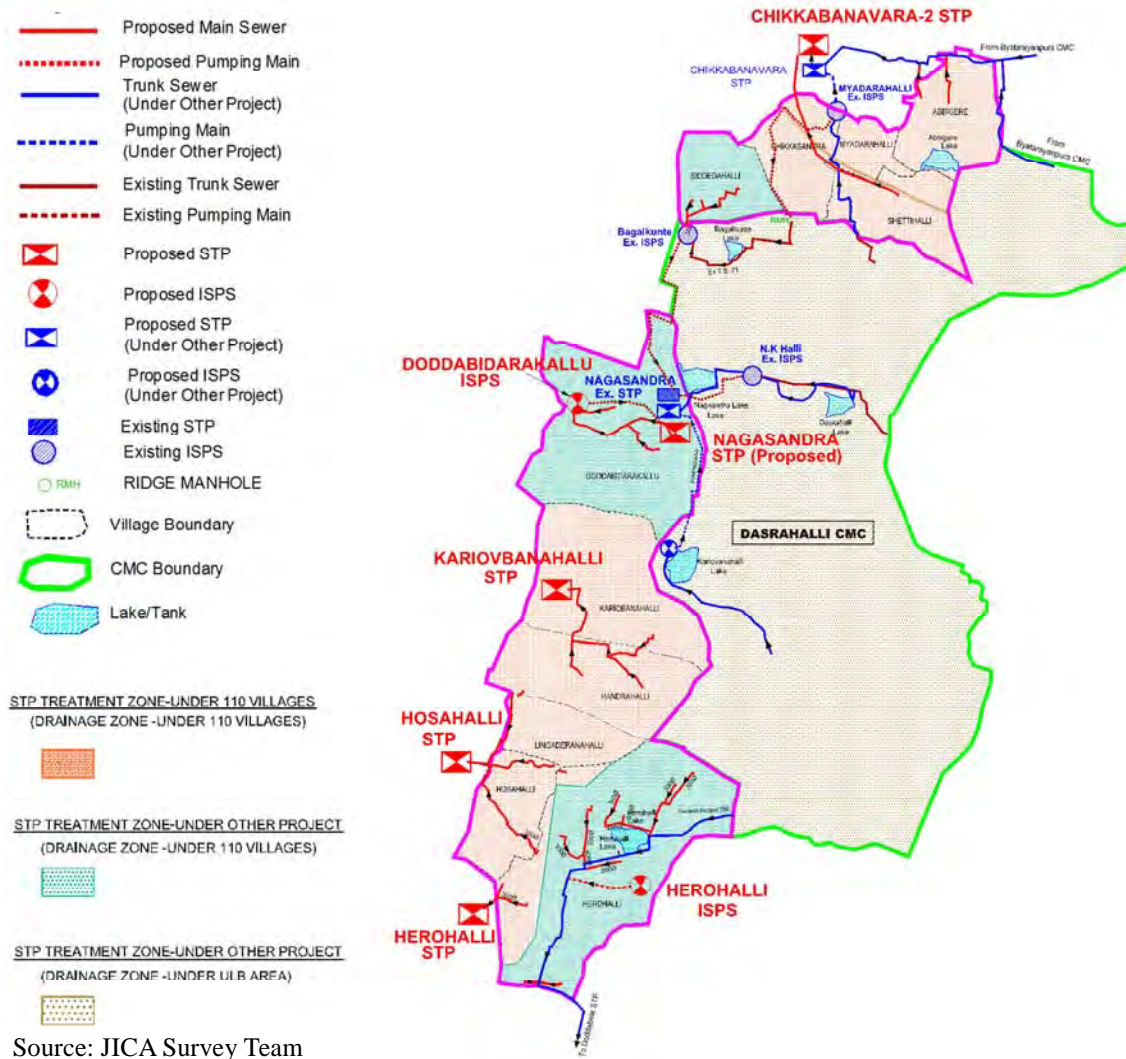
Layout Plan of Main Sewer Lines in Dasarahalli Zone
